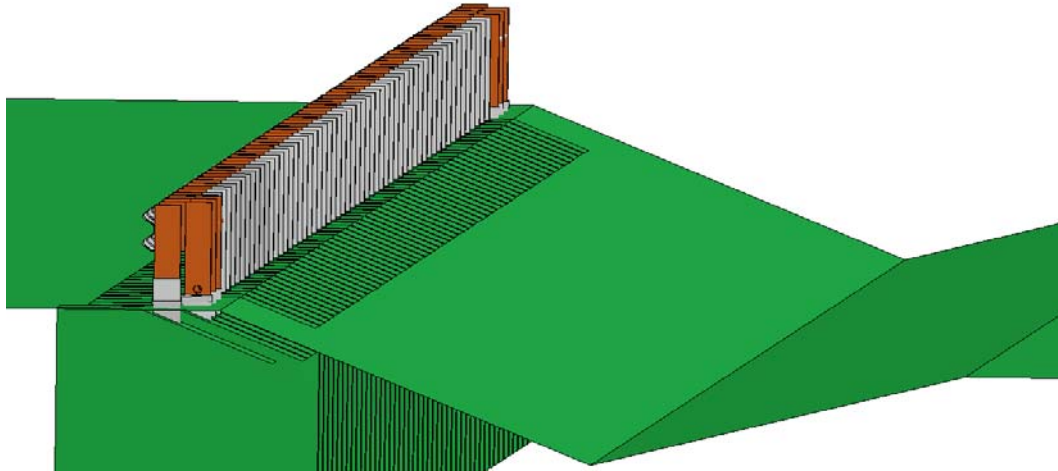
FE model of the single-faced guardrail installed on a 2.5H:1V slope.
